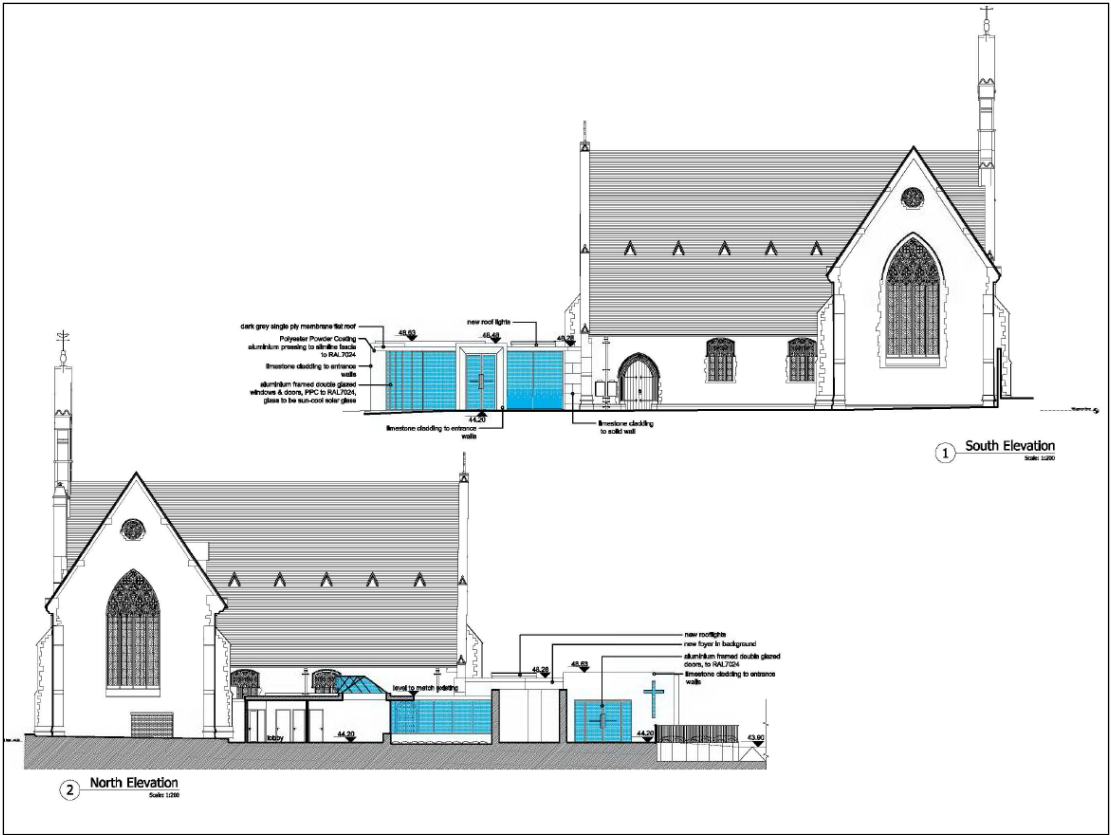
Proposed Elevations (Greyfriars Church, North & South)
